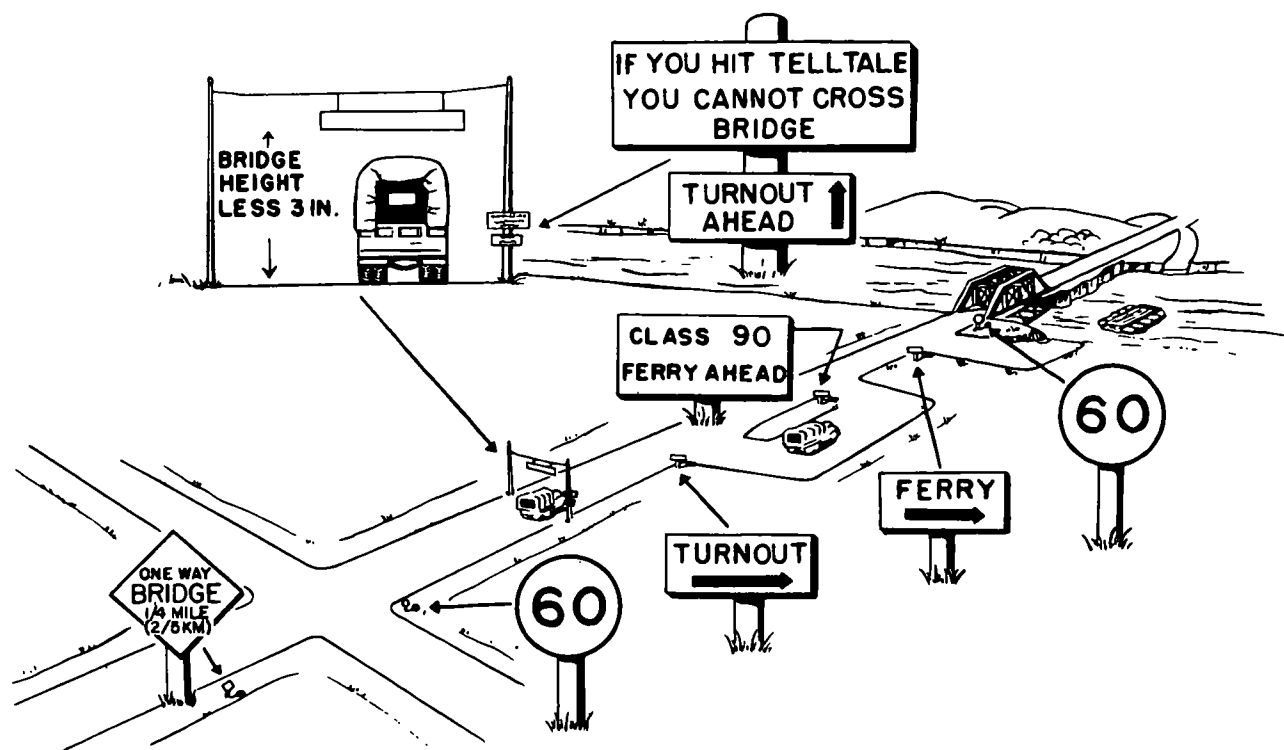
Typical arrangement of road-guide information and single-lane bridge-class signs.
